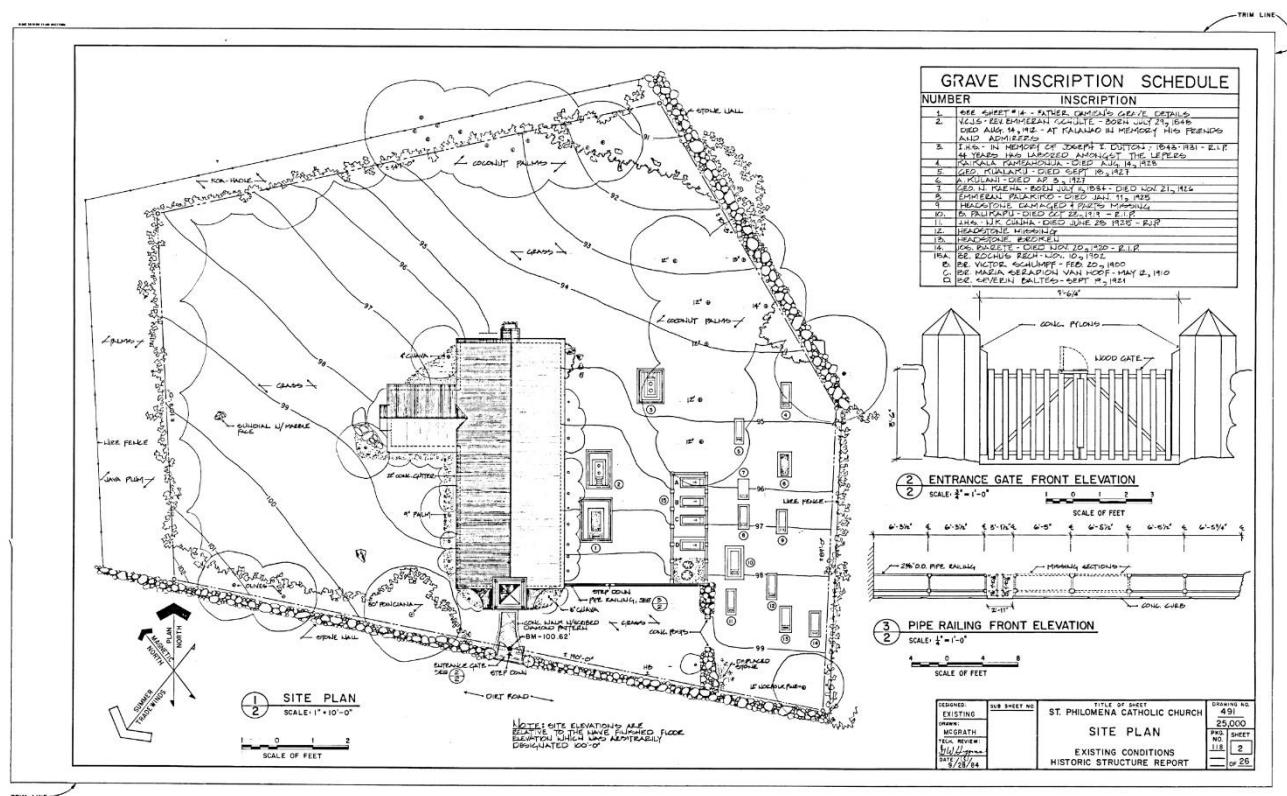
Site plan of St. Philomena Catholic Church and churchyard, indicating the arrangement of grave markers, from the 1985 St. Philomena Catholic Church Historic Structure Report. (Source: NPS Drawing No. 491/25,000, sheet 2 of 26)
